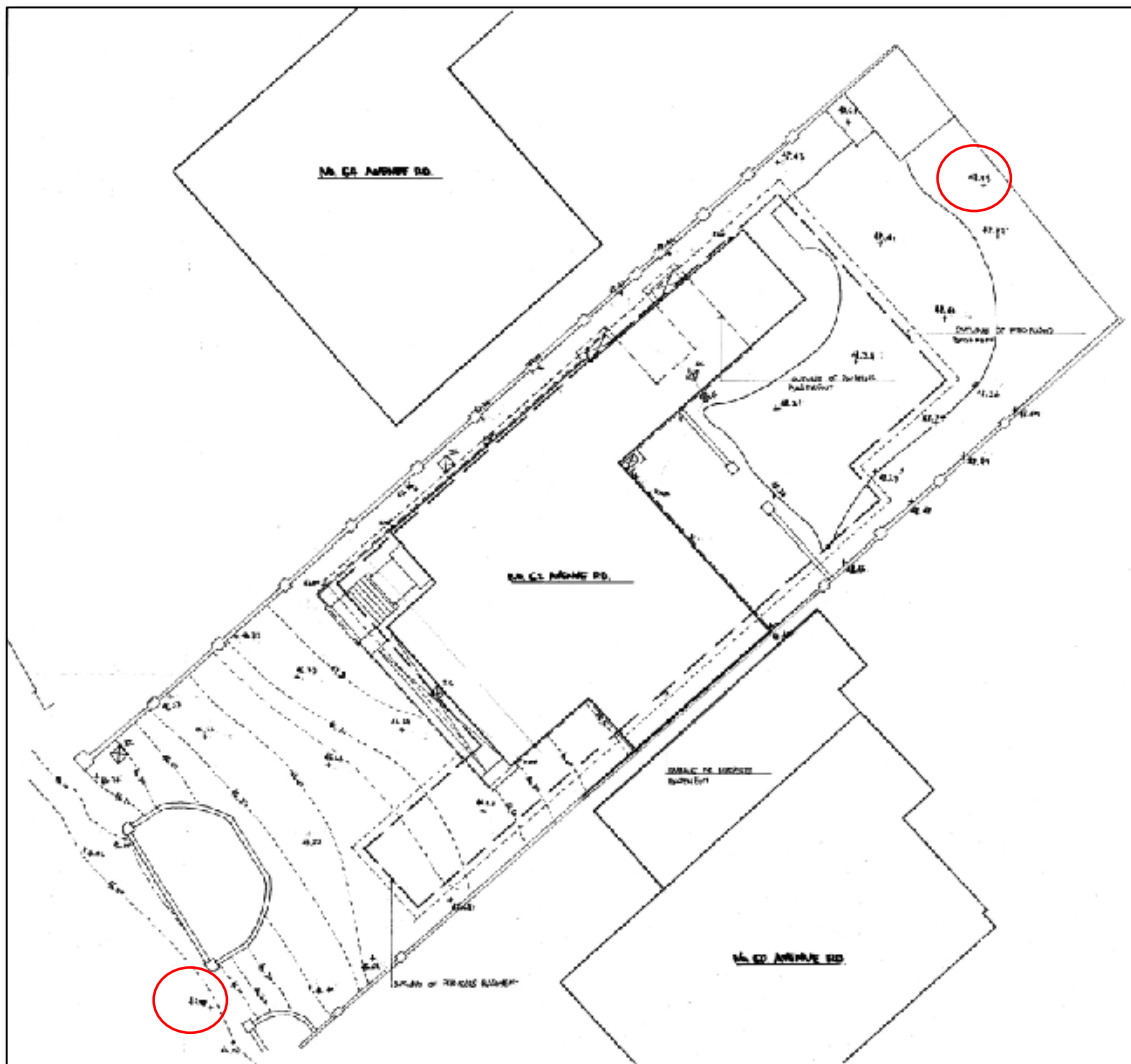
Extract of the Appendix 1, Plan 2 – Existing Site Plan and Topography
